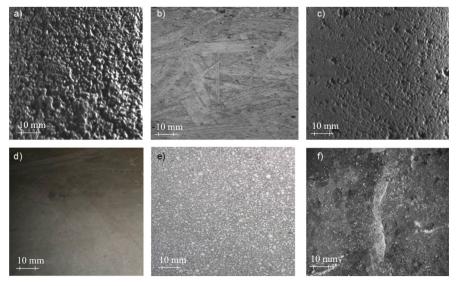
Black and white optical view of concrete surfaces: a) as cast, b) raw concrete formwork, c) ground, d) architectural, e) polished, f) aged concrete.
